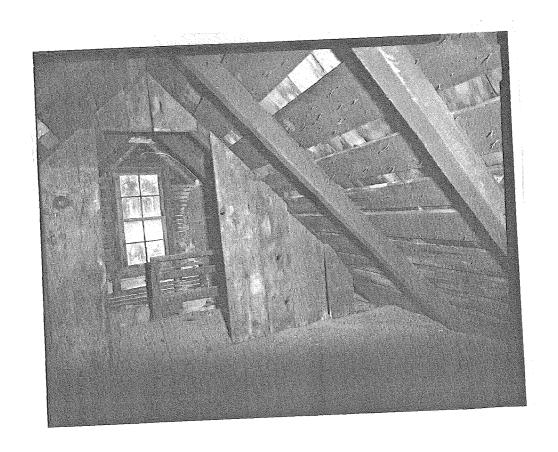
Bunker Hill Quarter, attic: view of northwest gable and roof framing, looking northwest.
